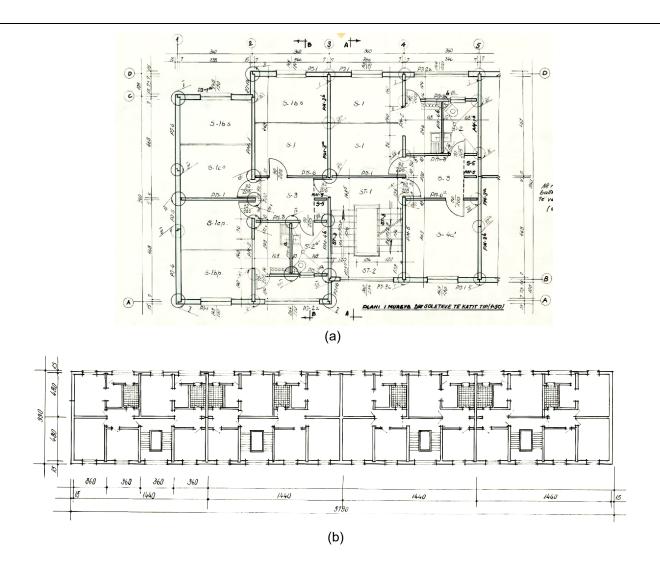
LPBs in Albania (example of Module 1 layout): (a) typical floor plans and (b) configurations (source: based on Abazaj, 2019).
